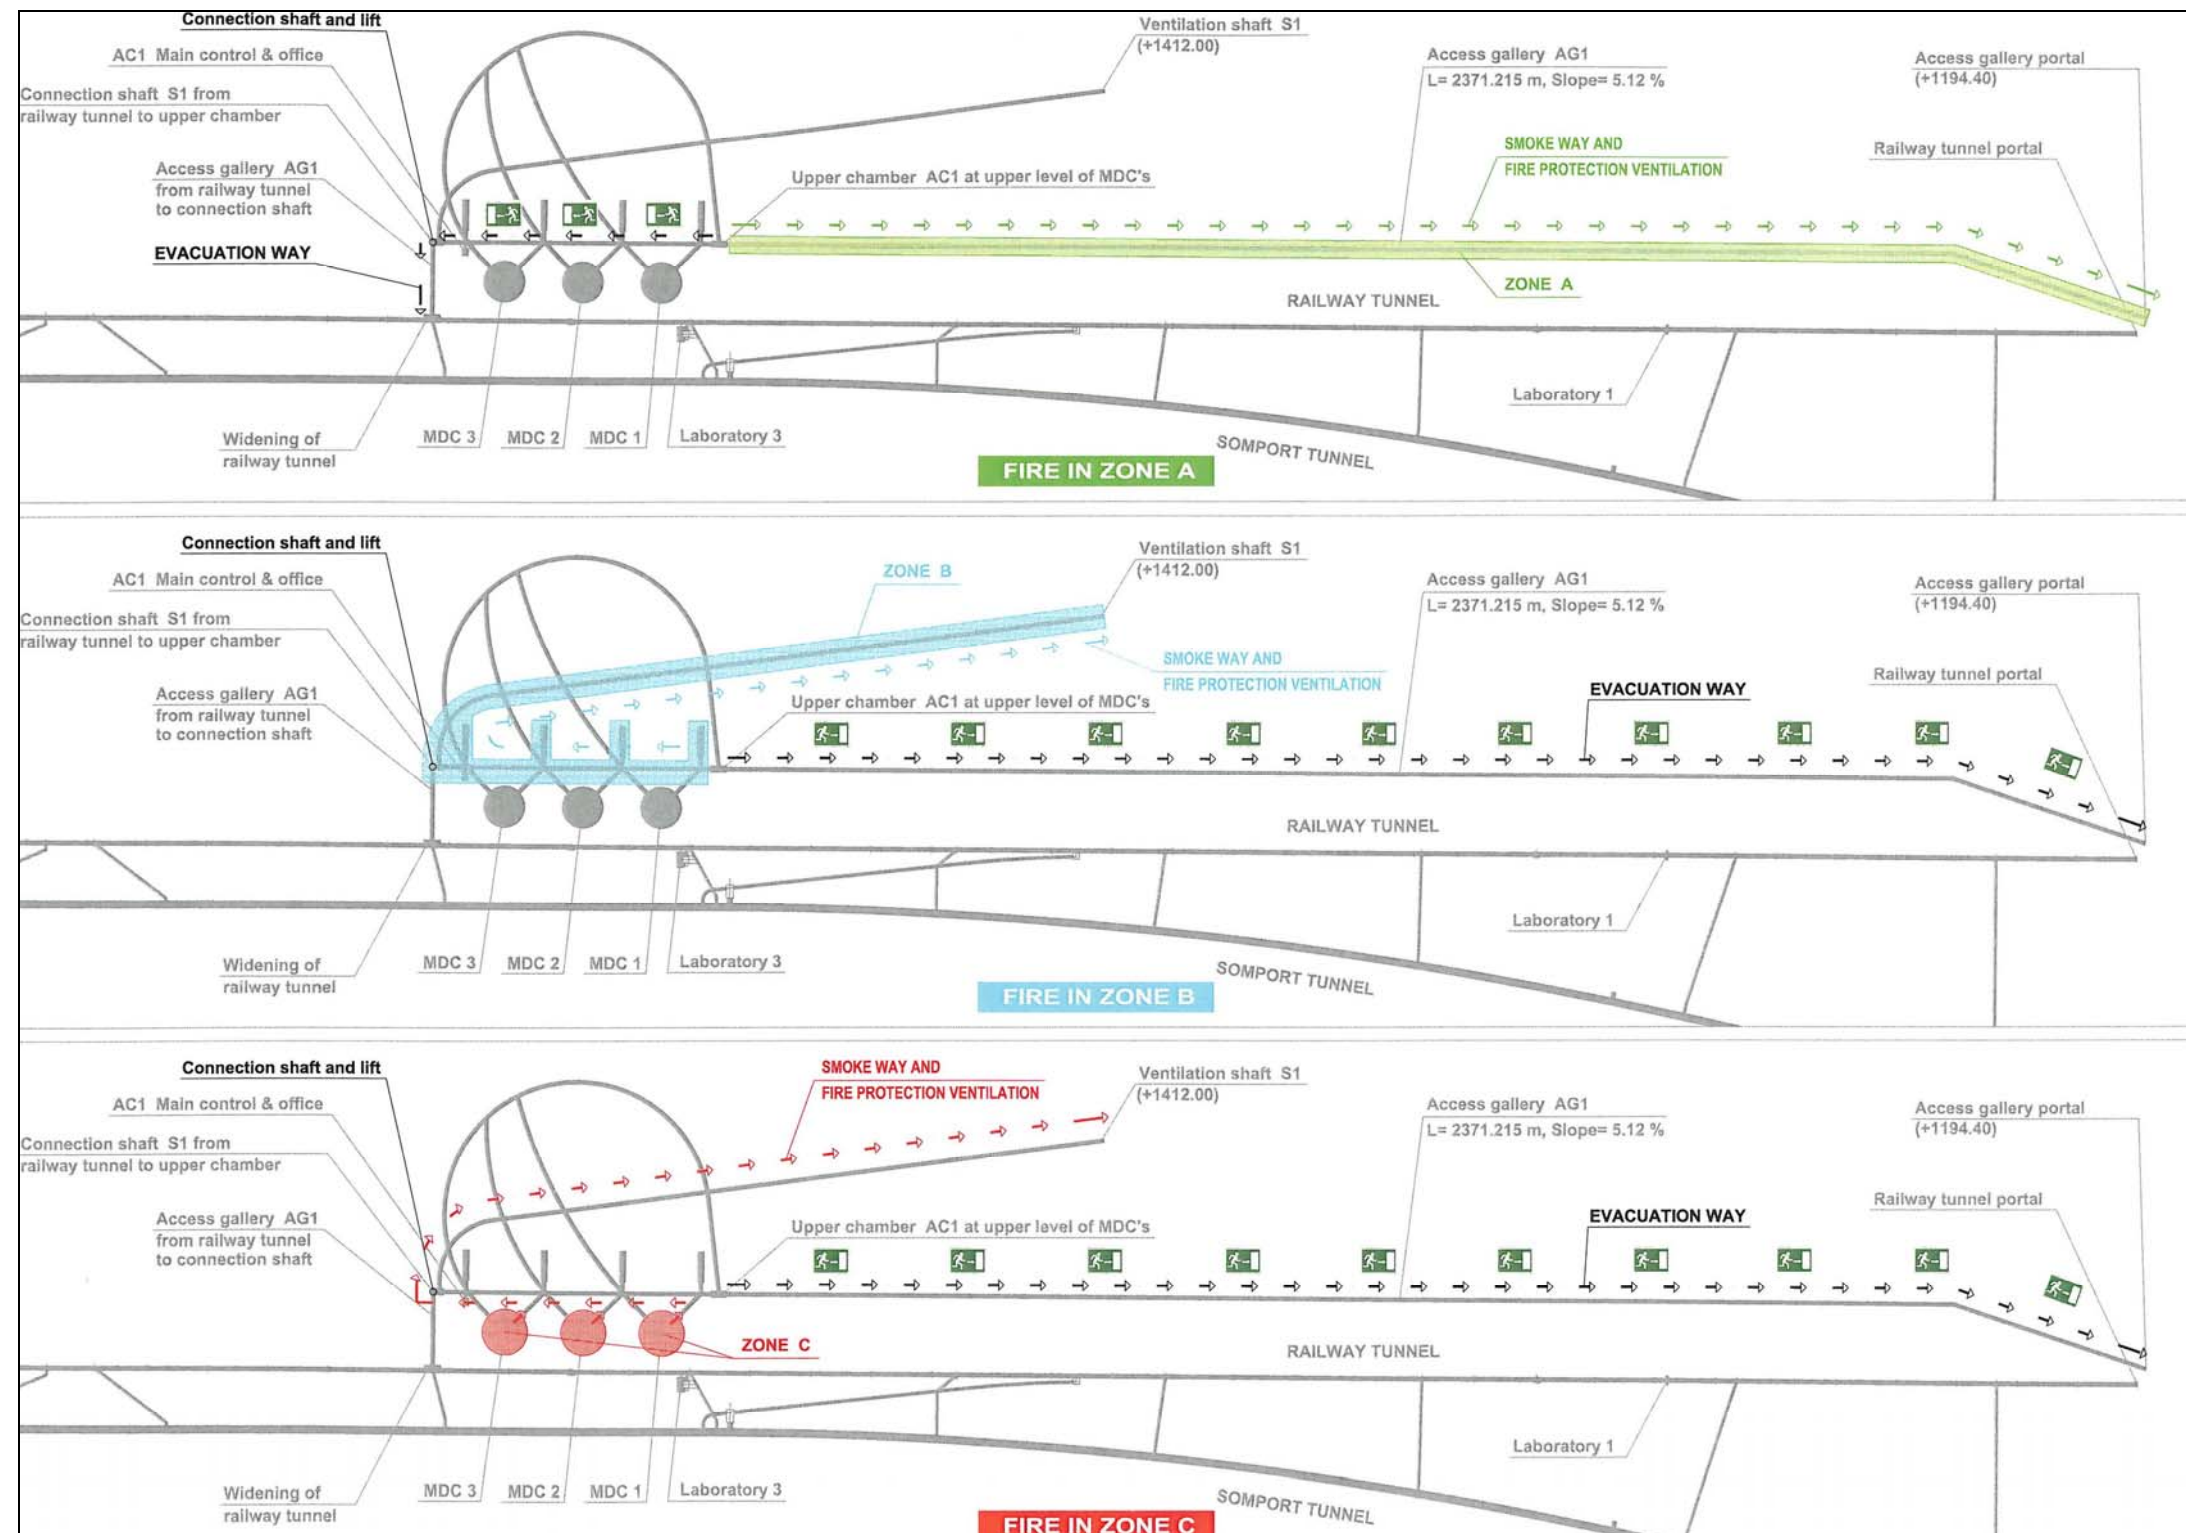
Evacuation plan and fire protection ventilation system
